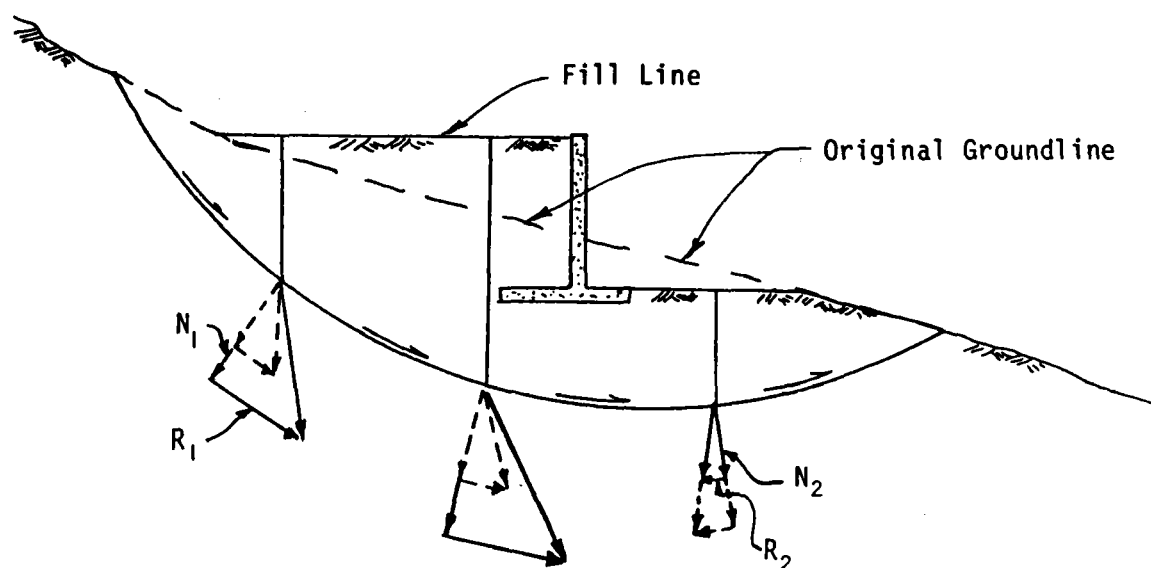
ROTATIONAL SLOPE INSTABILITY DUE TO EXCAVATION AND BACKFILL
